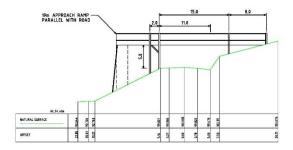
Concept sketch of proposed Old Warburton Road bridge (provided by Council)
